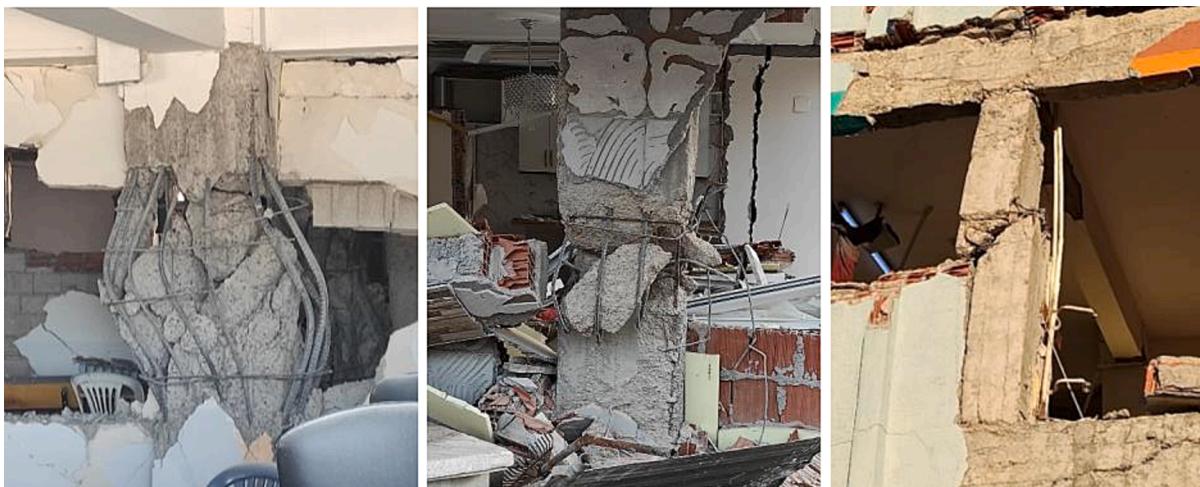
Column shear failures due to low concrete quality and insufficient shear reinforcement.
